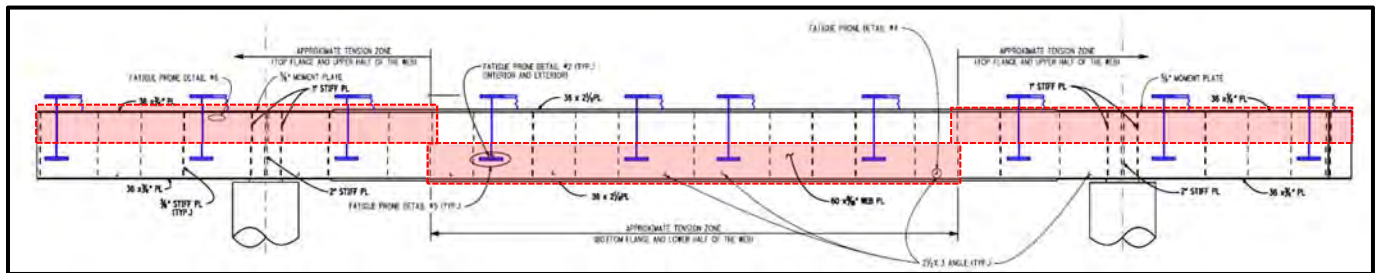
STA-077-0912 – Tension zones of fracture critical integral steel box girder
